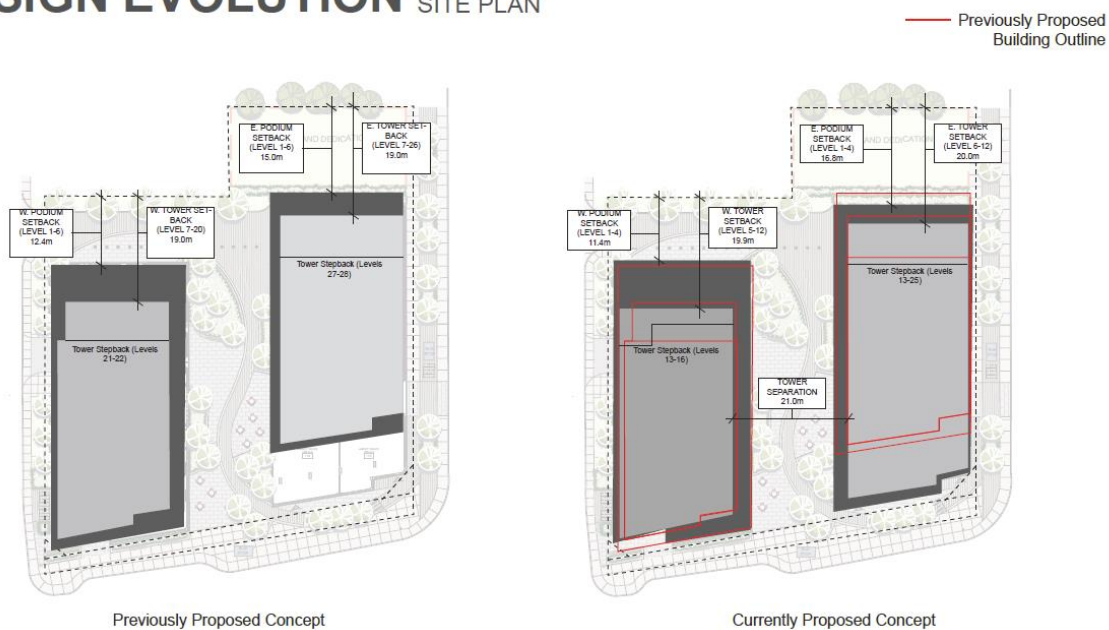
The current development concept's west building provides an 11.4m podium setback, and a 19.9m tower setback from levels 5 through 12. The tower has an additional jogged stepback ranging from 2.7m to 6.2m at levels 13 through 16. The East building provides a 16.8m podium setback and 20.0m tower setback from levels 5 through 12. The tower has an additional 7.0m stepback from levels 13 through 25. Further, the mechanical penthouses of each building have been relocated to align with the southern façade, providing greater relief from the abutting neighbourhood to the North. Hobin/Fotenn 2022.
